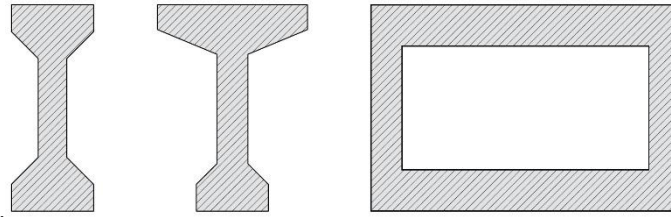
Cross-sections I-girder, T-girder and box-girder
